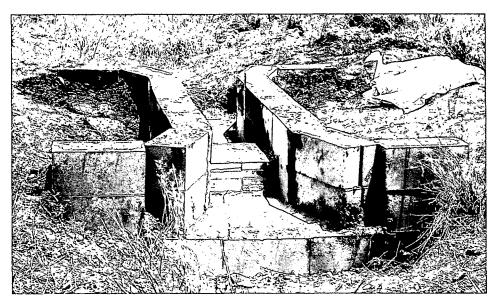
Downstream view of a rectangular-throated flume constructed from concrete block.
